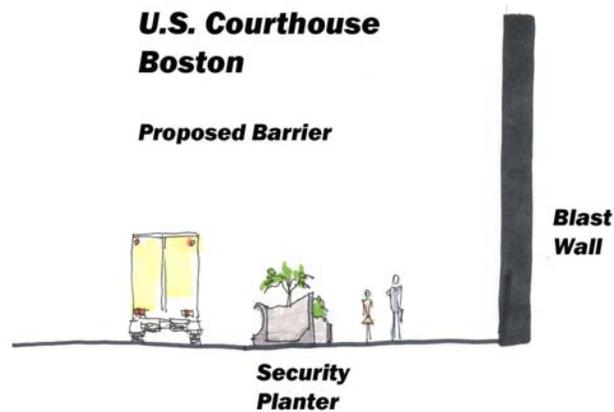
Recommended Security Barrier, U.S. Courthouse, Boston, Massachusetts
